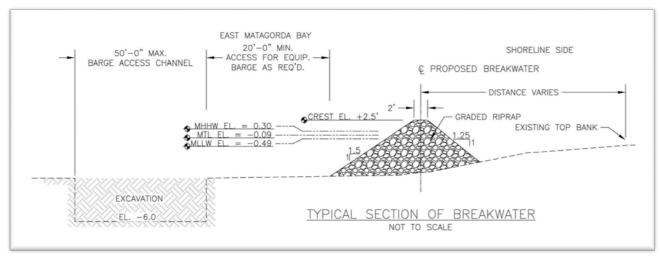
Typical breakwater design and temporary access channel (TPWD 2016)
